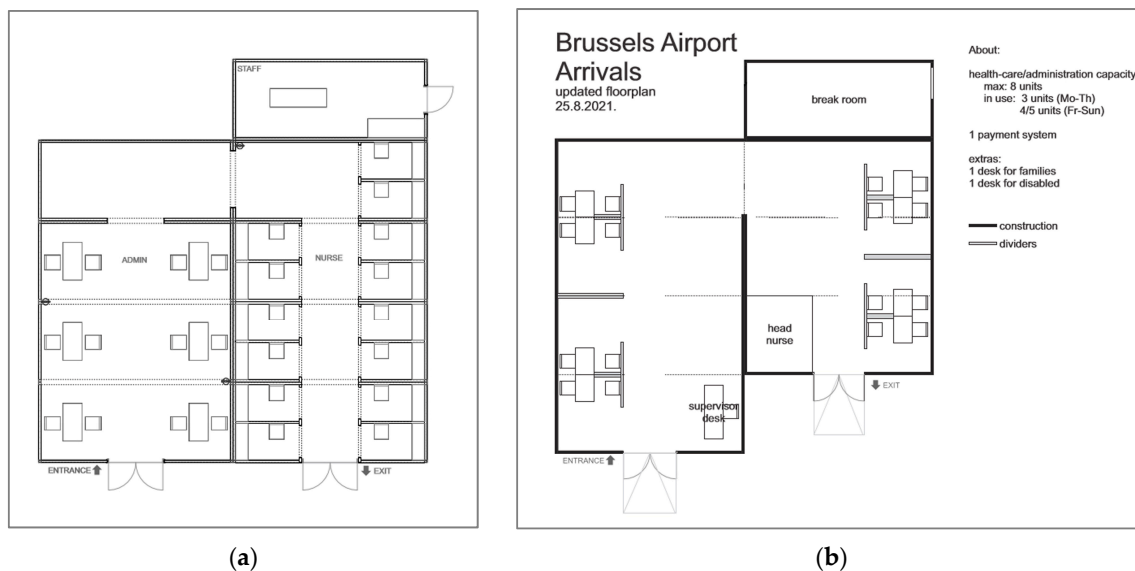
COVID-19 arrivals test center: (a) floor plan; and (b) updated floor plan. (Source: authors, 2022).
